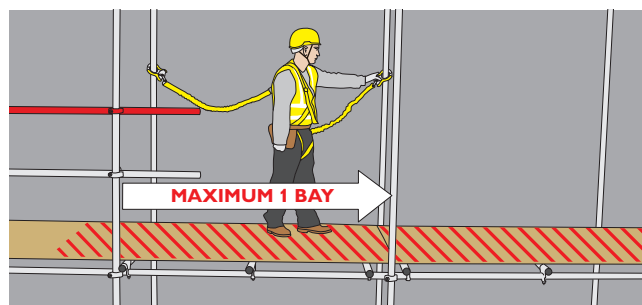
Scaffolder traversing on an unprotected platform remaining attached using a twin lanyard system of work with anchor devices for fixing to standards. The scaffolder should not traverse more than one bay before installing the guardrail that forms the scaffolders' safe zone.
